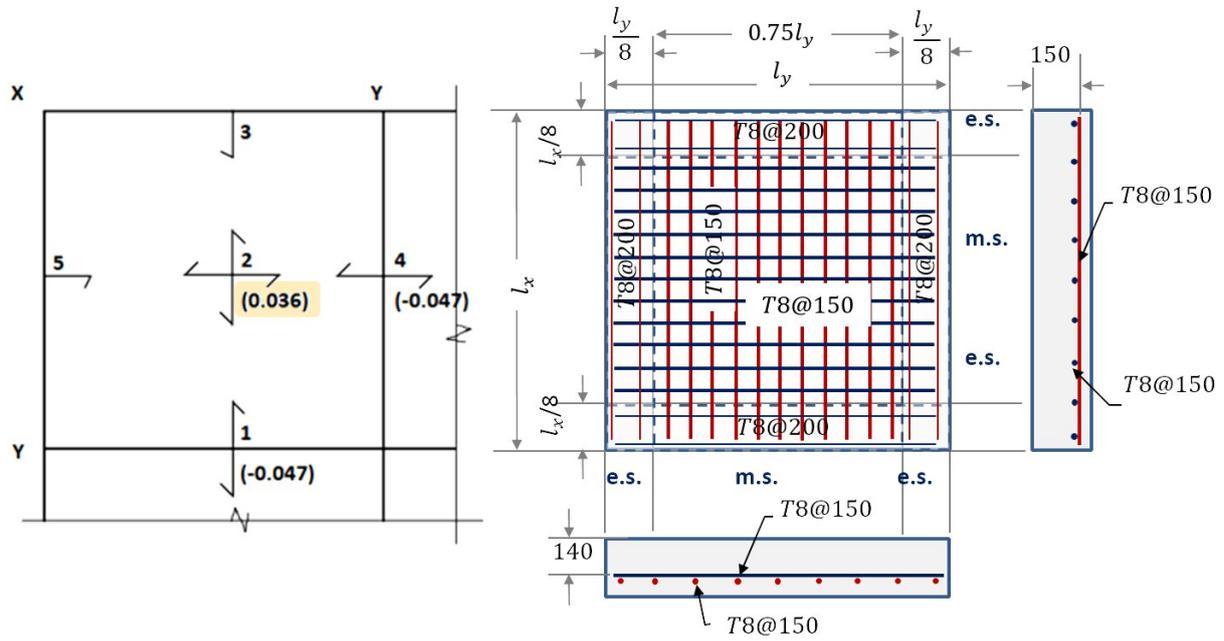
Slab midspan reinforcement: bottom steel T8@150
